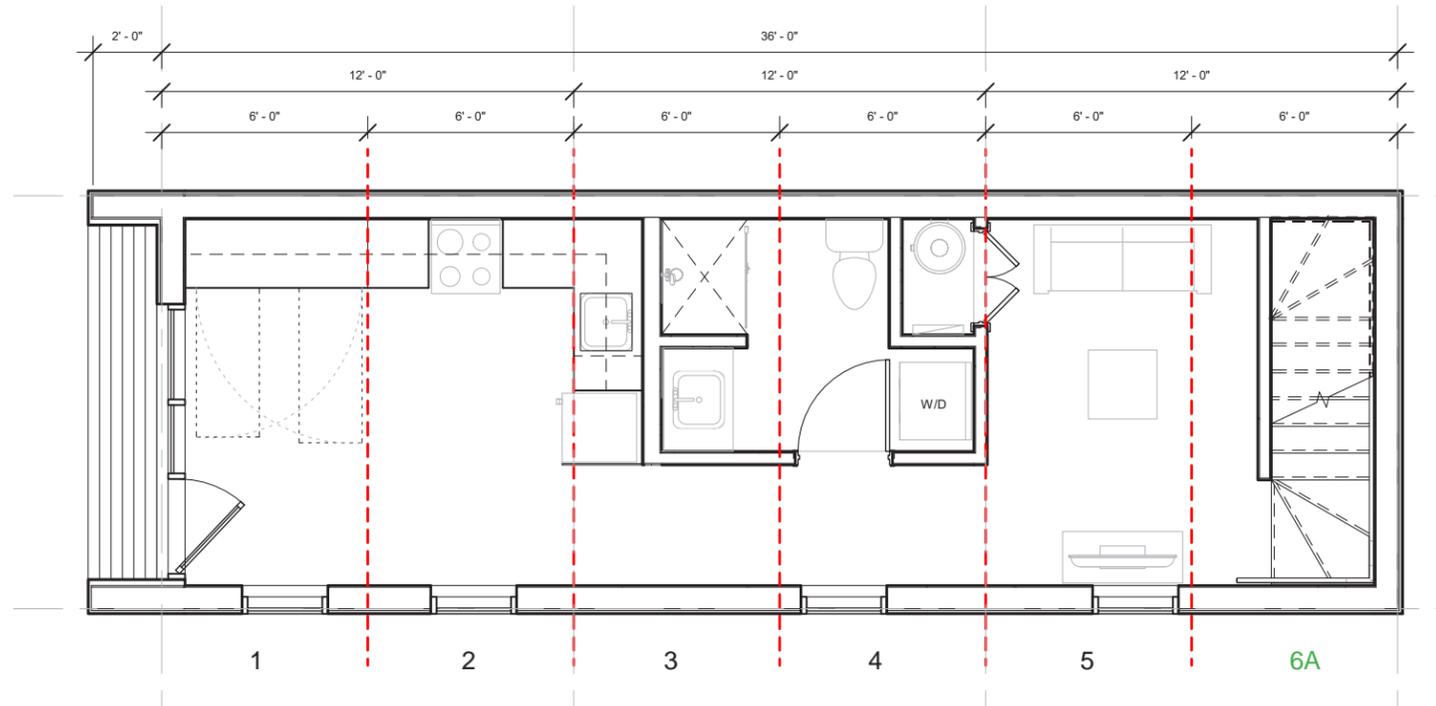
+ 70 BASE LEVEL FLOOR PLANS
